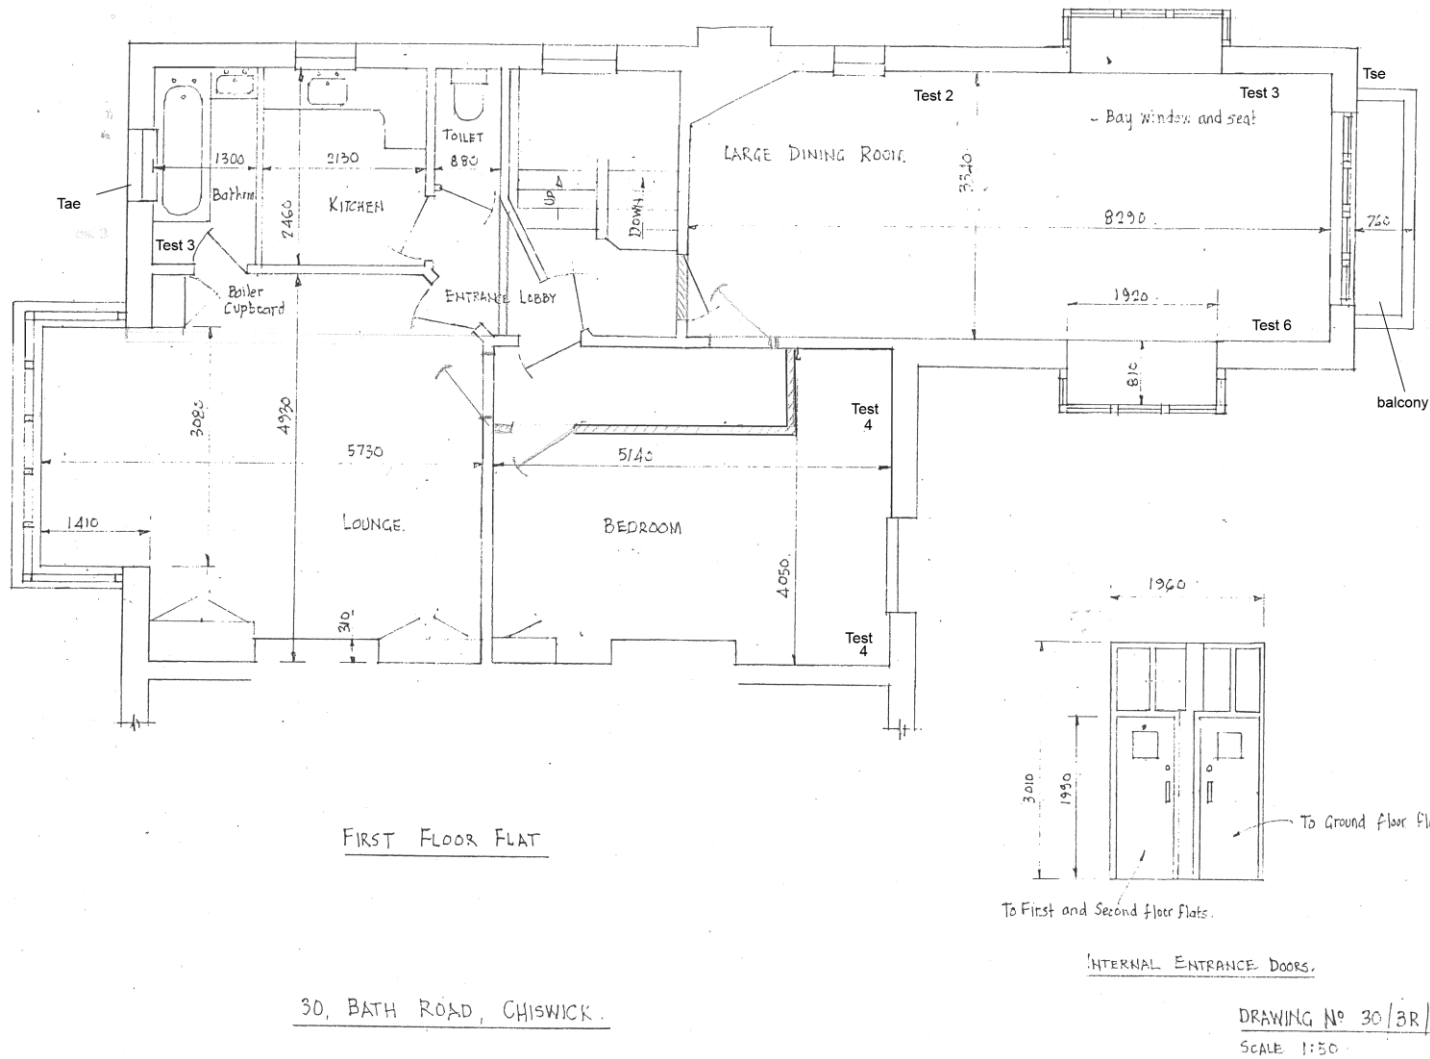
Plan drawing of dwelling used for field tests (front façade to the left)
